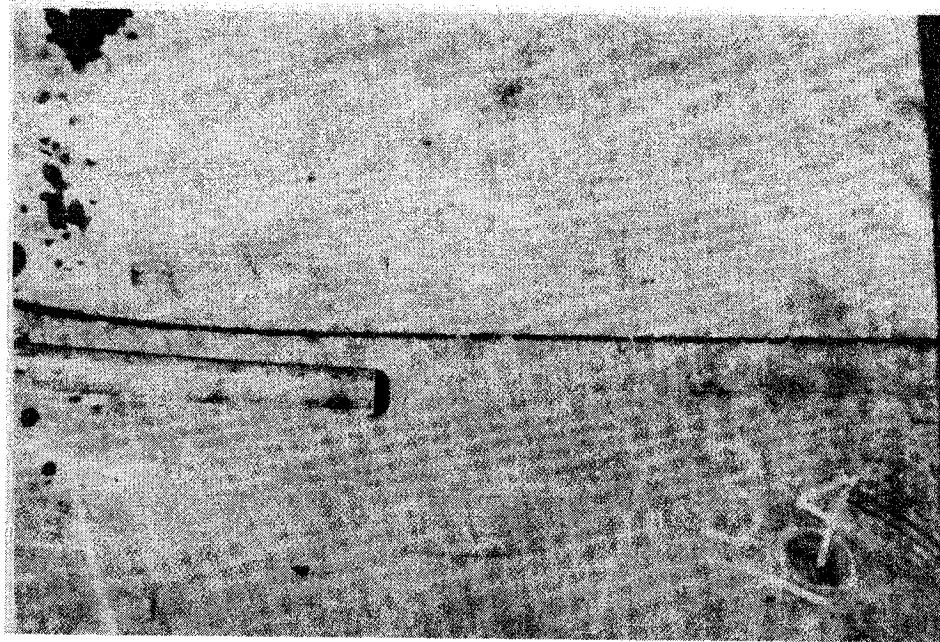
Plan View of Brittle Fracture in Flange
